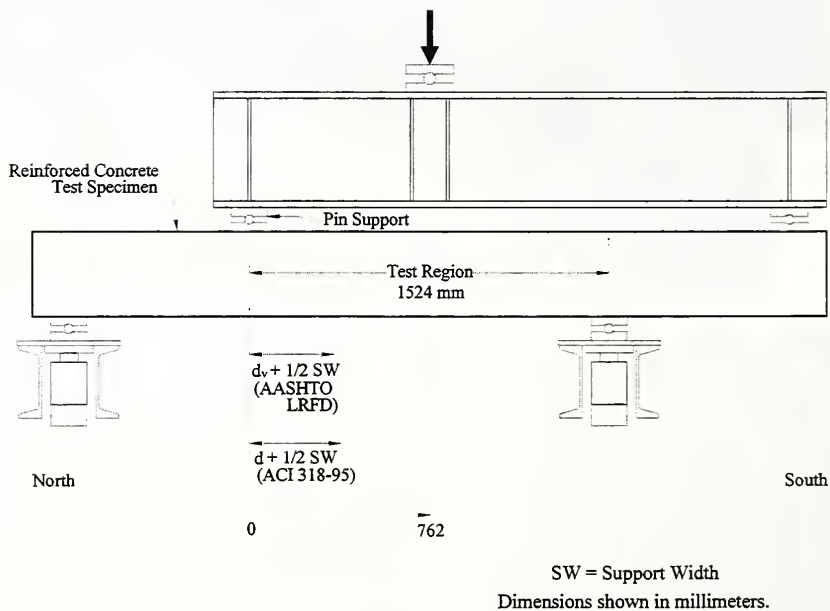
Locations of Critical Sections for Shear, Reinforced Concrete Specimens
